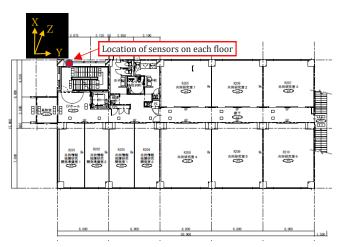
Plan view of 2nd floor of the building and locations of practical device installed.
